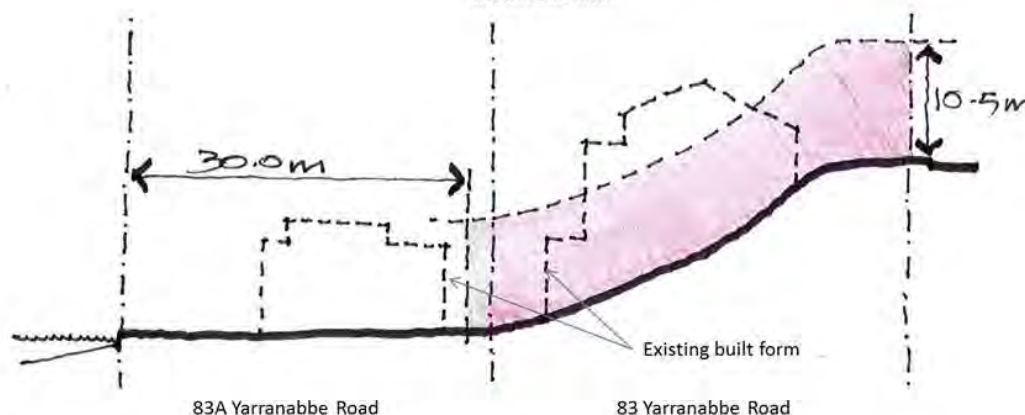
Existing Woollahra LEP 2014 building envelope for multi dwelling housing or RFB development
